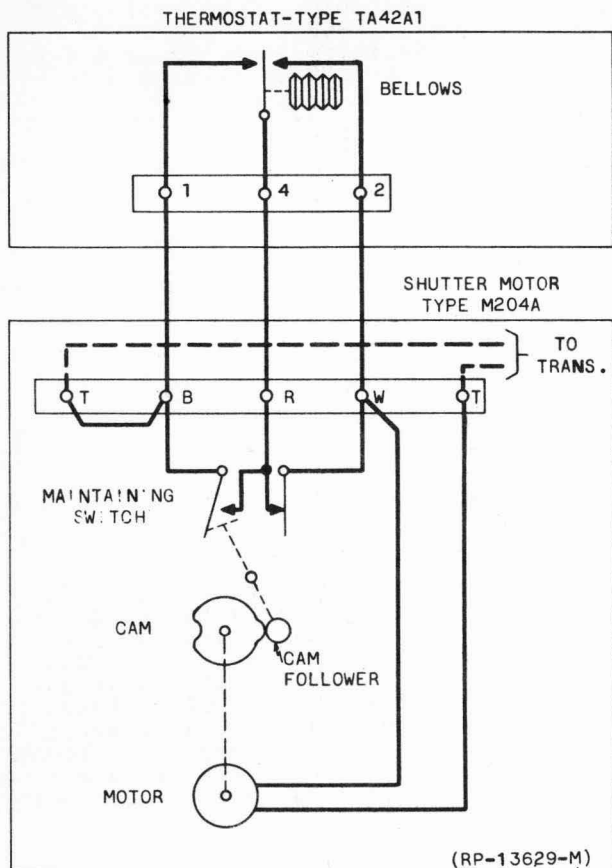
SCHEMATIC -M204A TYPE SHUTTER MOTOR
